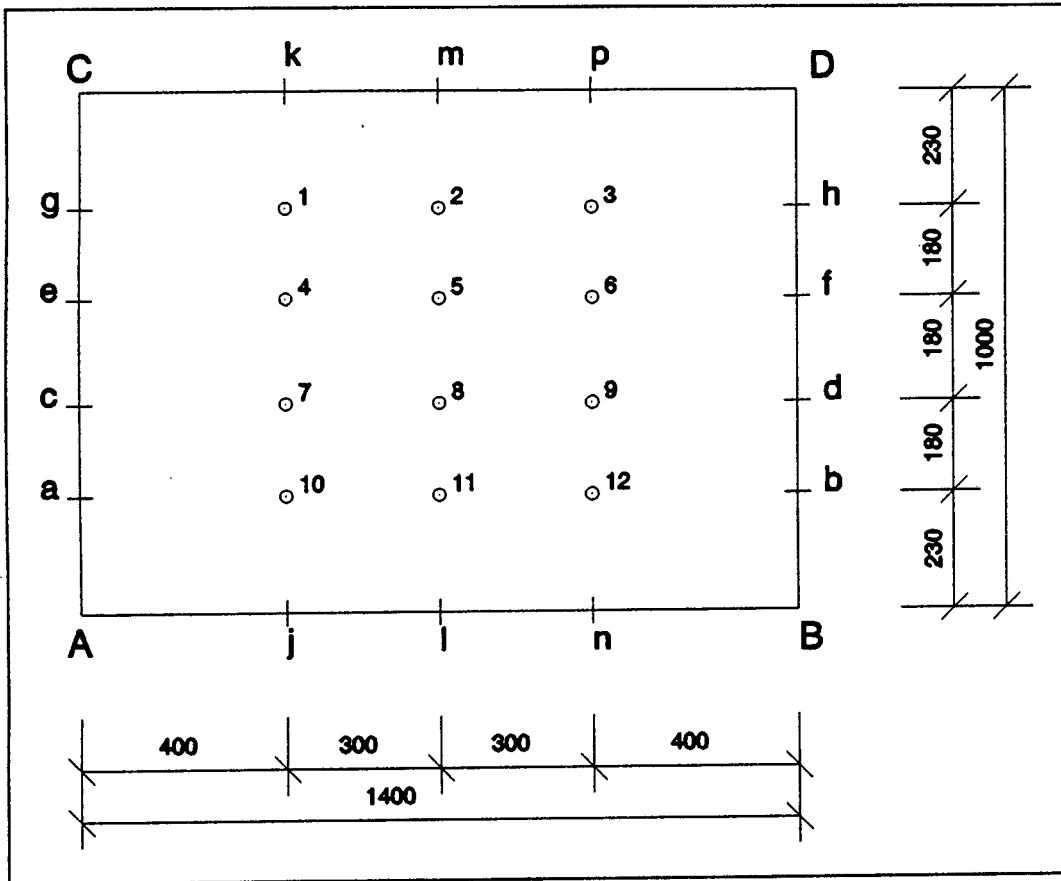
Dial gauge layout for Rectangular Slabs Cooke
